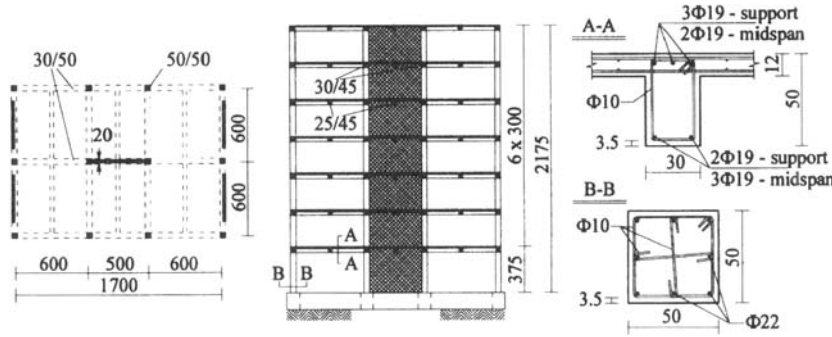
Plan, elevation and typical cross-section of structural members of the frame-wall building
